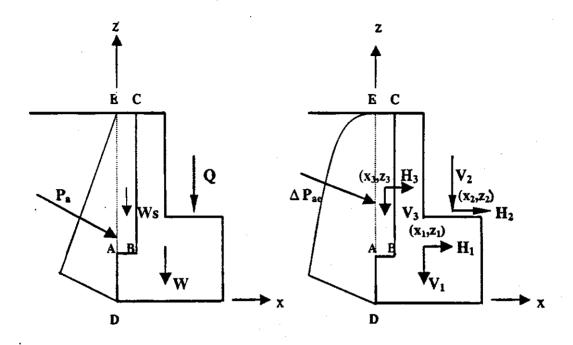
Translation and Rotation Movement of Bridge Abutment Forces Acting on the Non-Integral Bridge Abutment
